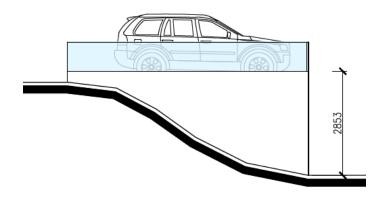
Proposed north elevation. Extract from drawing number: 1610/P-102
